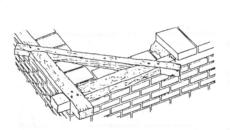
Strengthening of wall corners by diagonal wooden bracings (taken from Morales et
